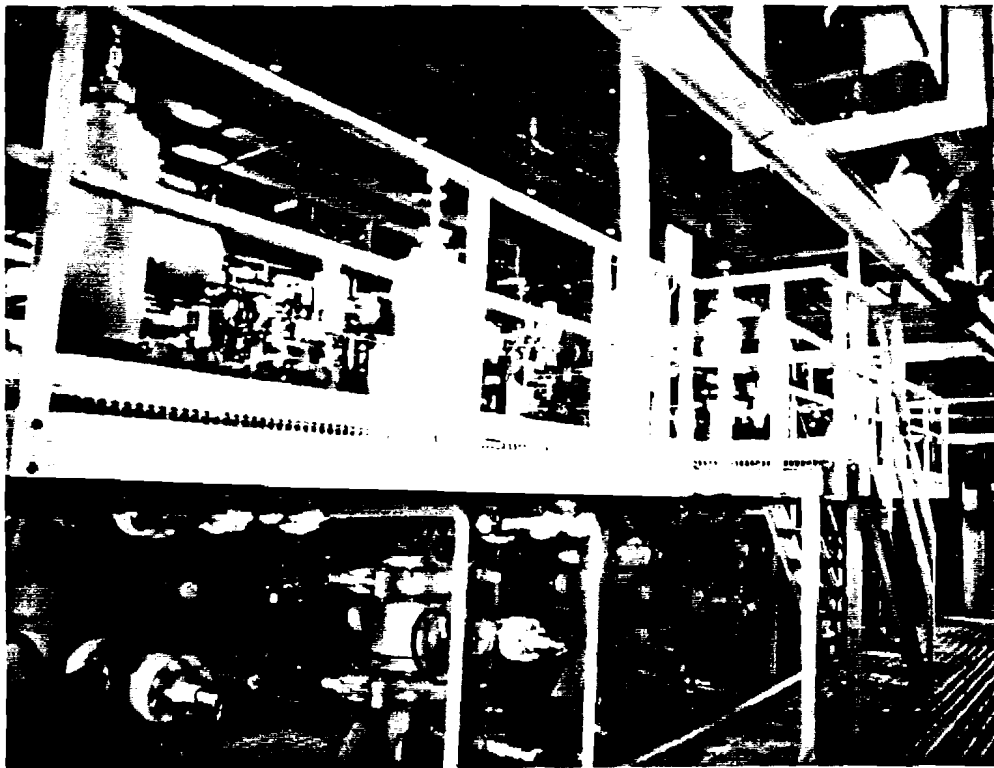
FRP Grating, Stairs, Handrails and Wellhead Access Structure on an Offshore Platform (Photo courtesy of MMFG)
